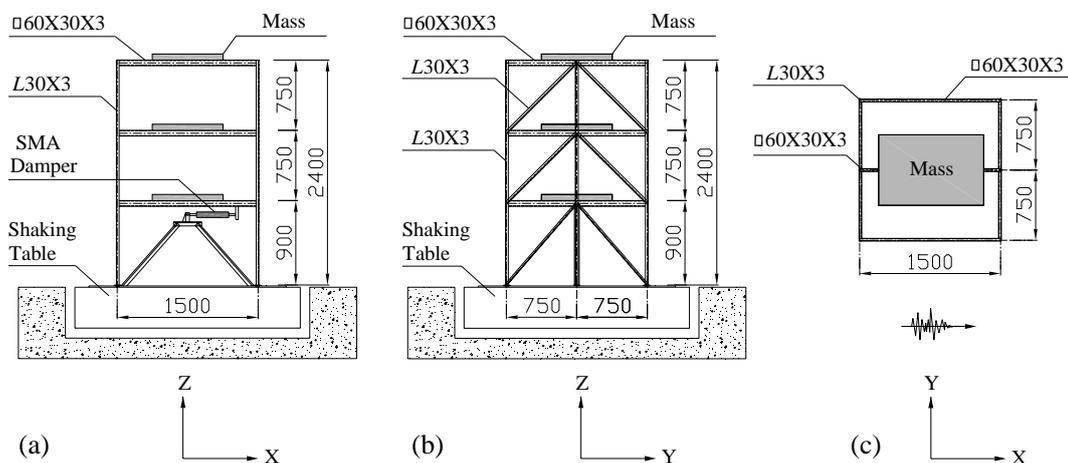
Geometrical characteristics of the steel frame model (unit: mm):
